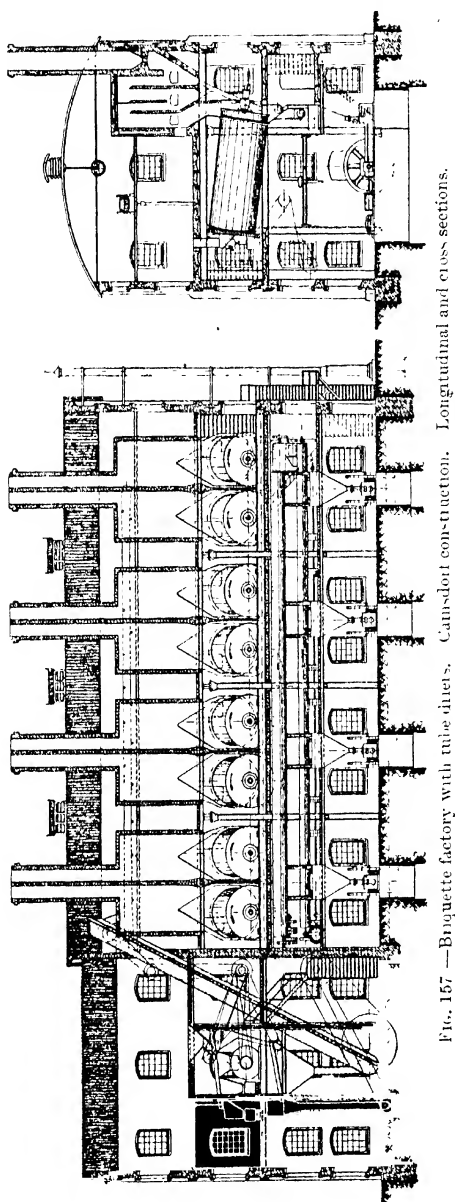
Briquette factory with tube driers. Caisson construction. Longitudinal and cross sections.
